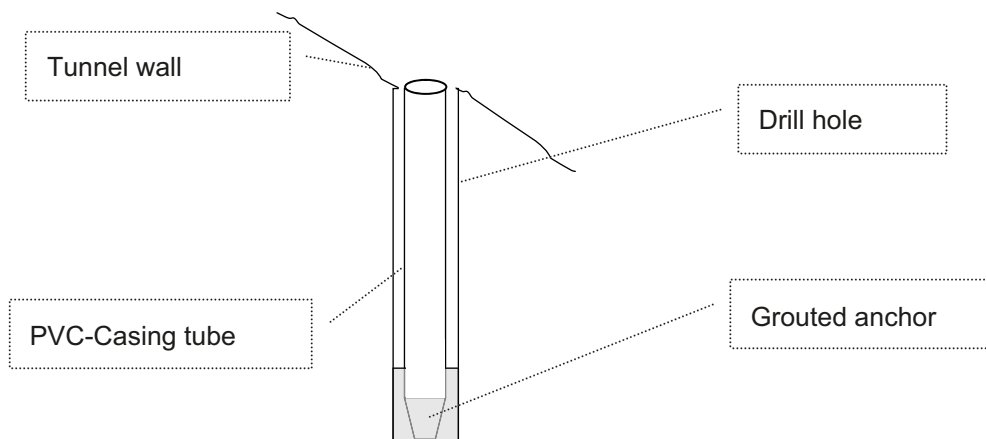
Top view of a gauge hole, the anchor is grouted to the drill hole wall.
